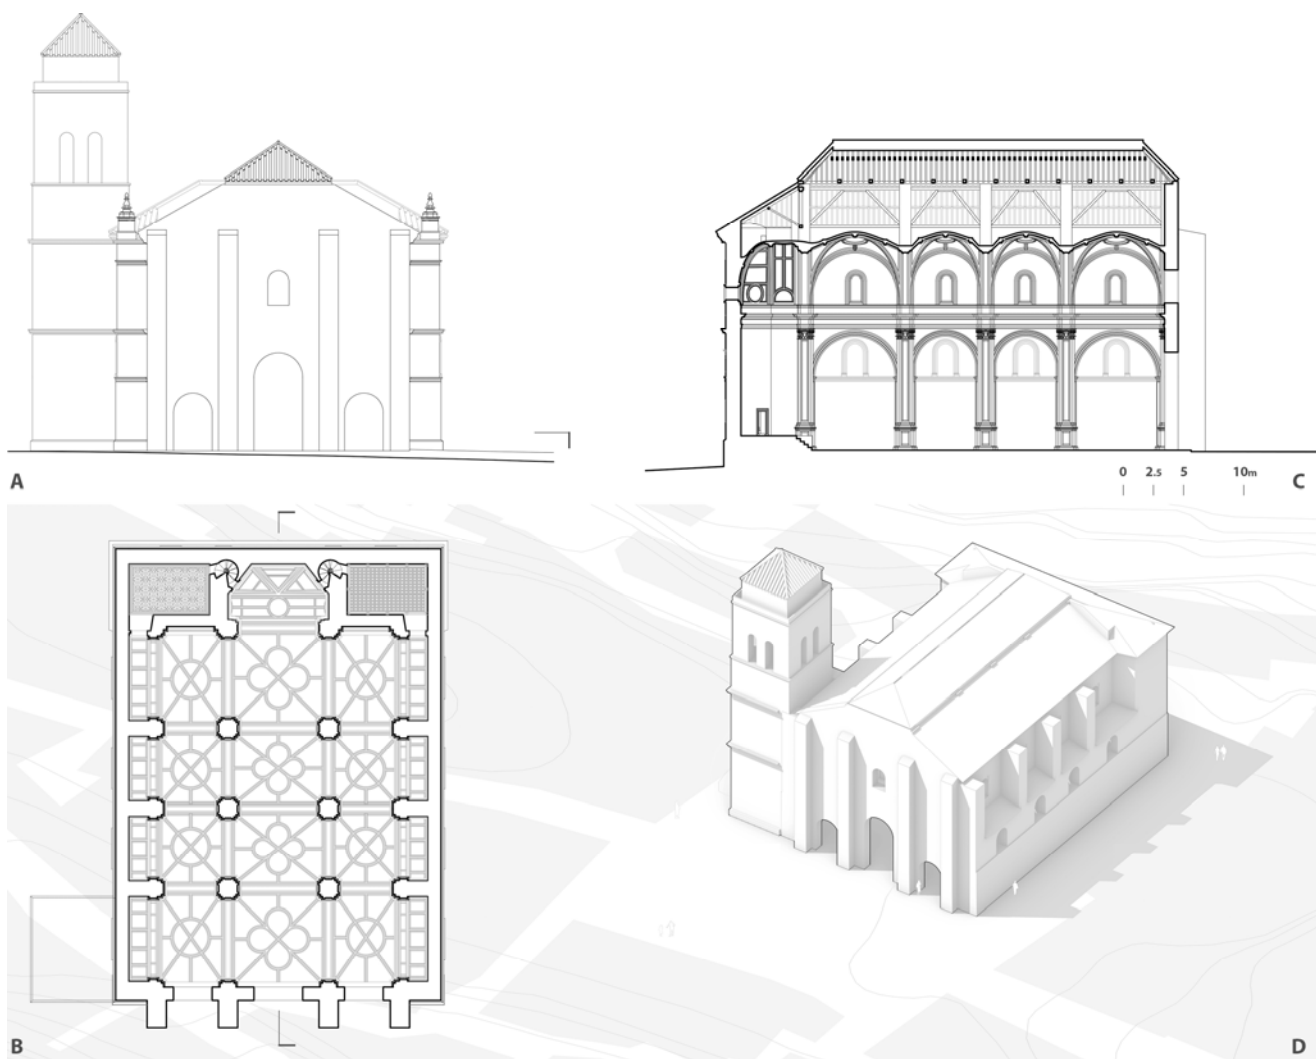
Digital reconstruction of the original project: (a) North elevation, (b) floor plan, (c) longitudinal section and (d) perspective rendering. Author's own.
